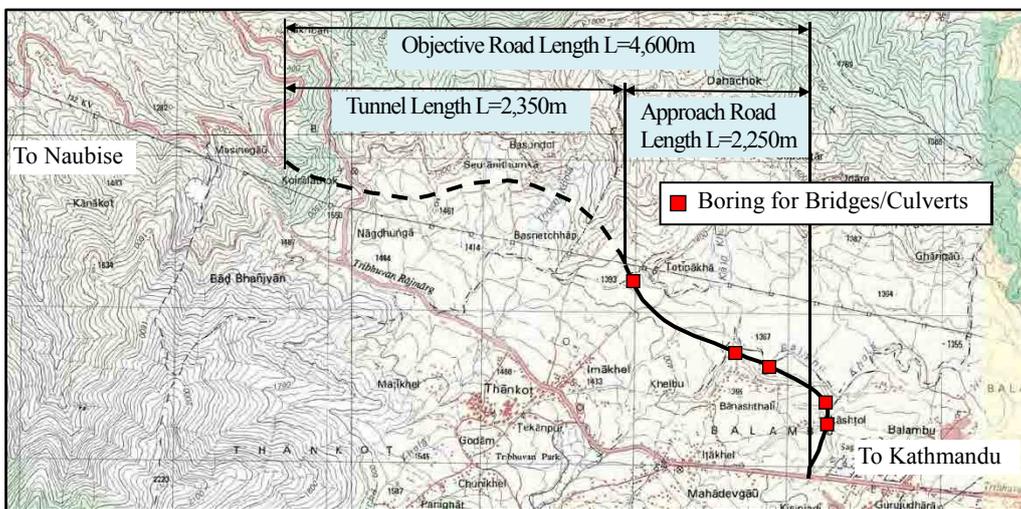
BORING LOCATIONS FOR BRIDGES/CULVERTS
